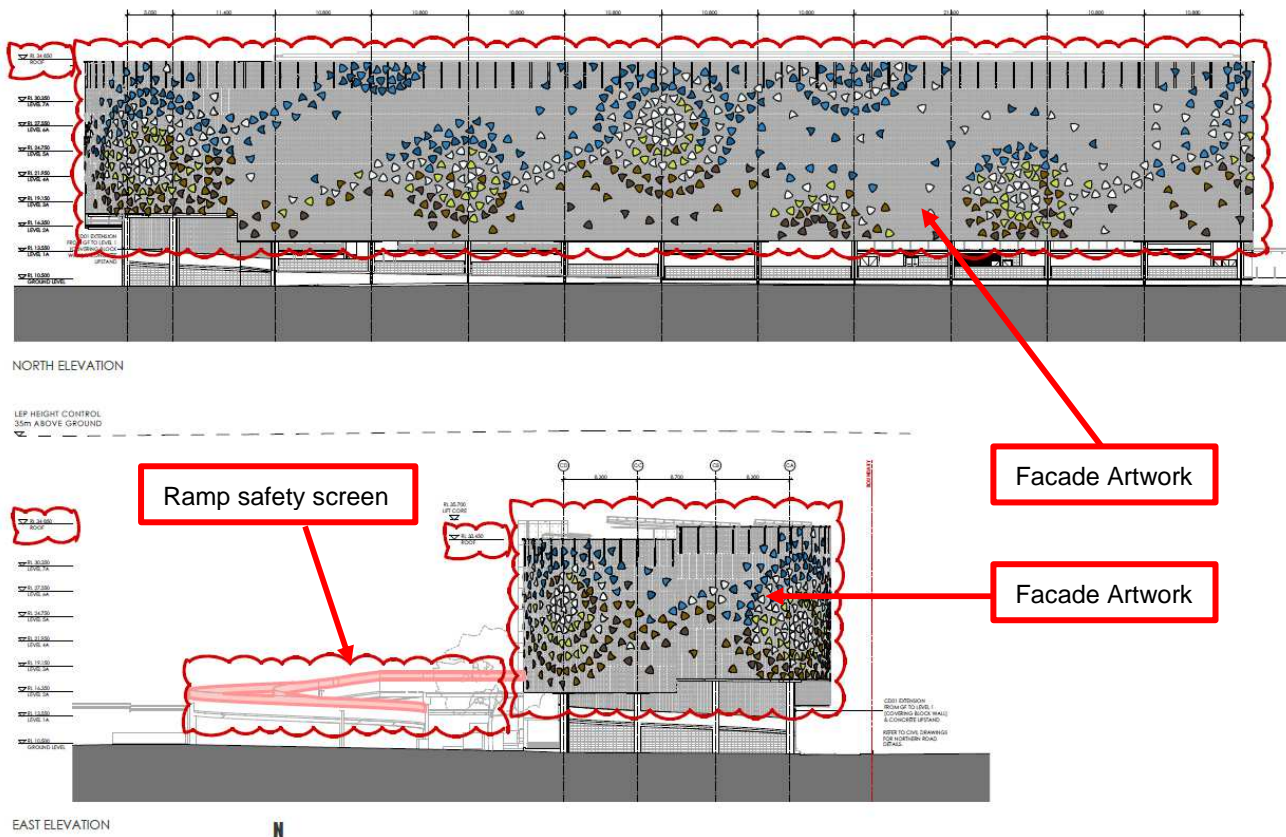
Proposed Amendment – Façade view (north and east elevations)
